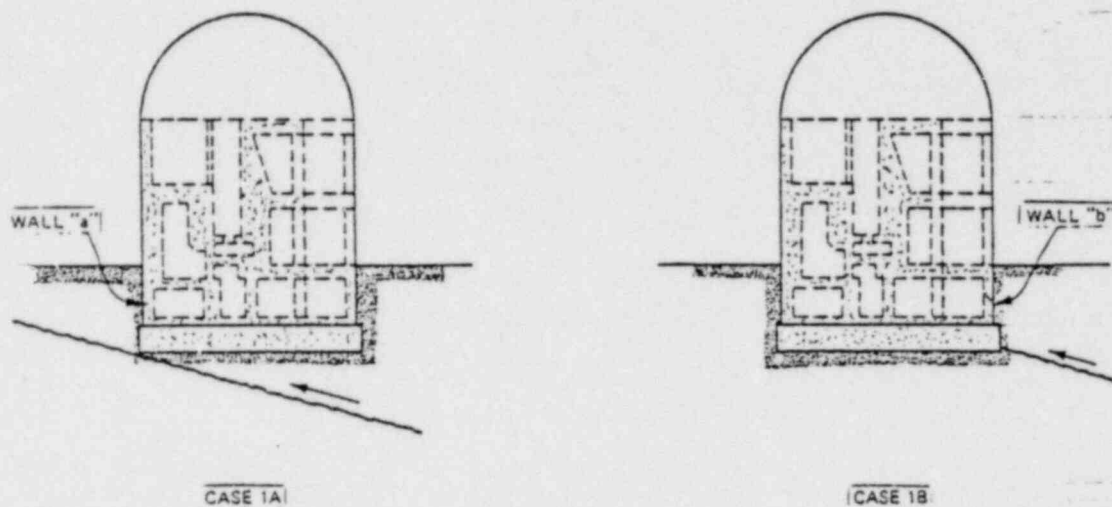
CASE 1 - POTENTIAL FOR SOIL PRESSURES ON WALLS
